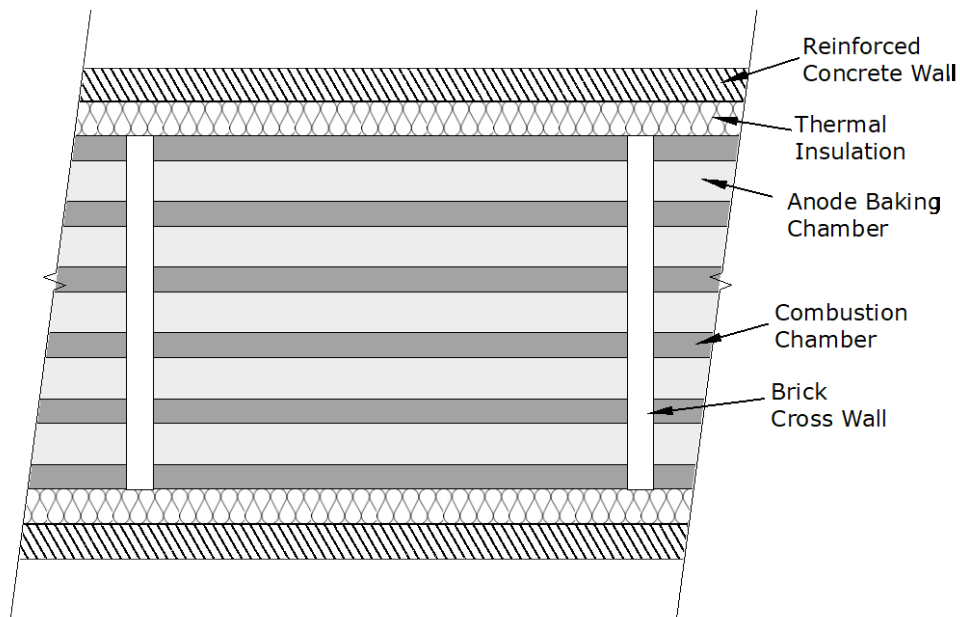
Horizontal section of the anode baking furnace, schematic, not on scale with reinforced concrete wall, fire-resistant thermal insulation, anode baking chamber, combustion chamber and brick cross-wall (Drawing, courtesy Tilman Reinhardt)
